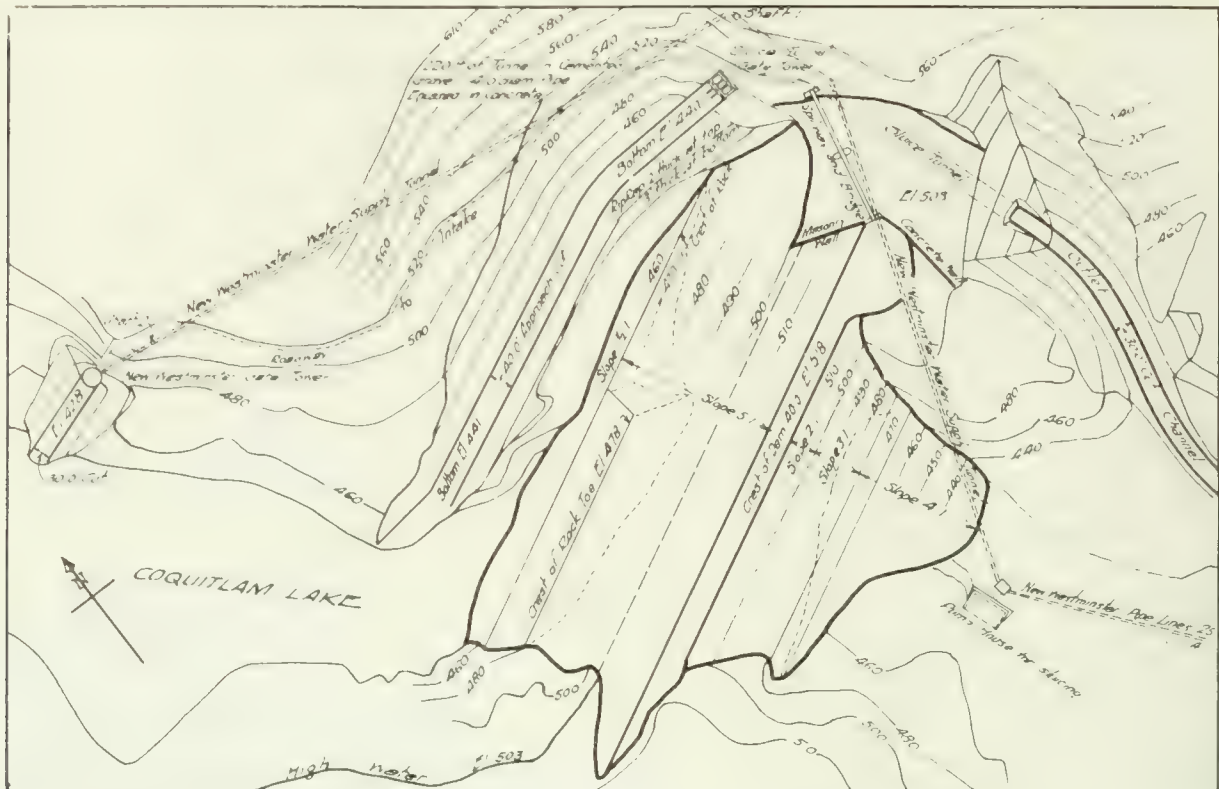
General Plan of the Coquitlam Dam, and Surrounding Development.
